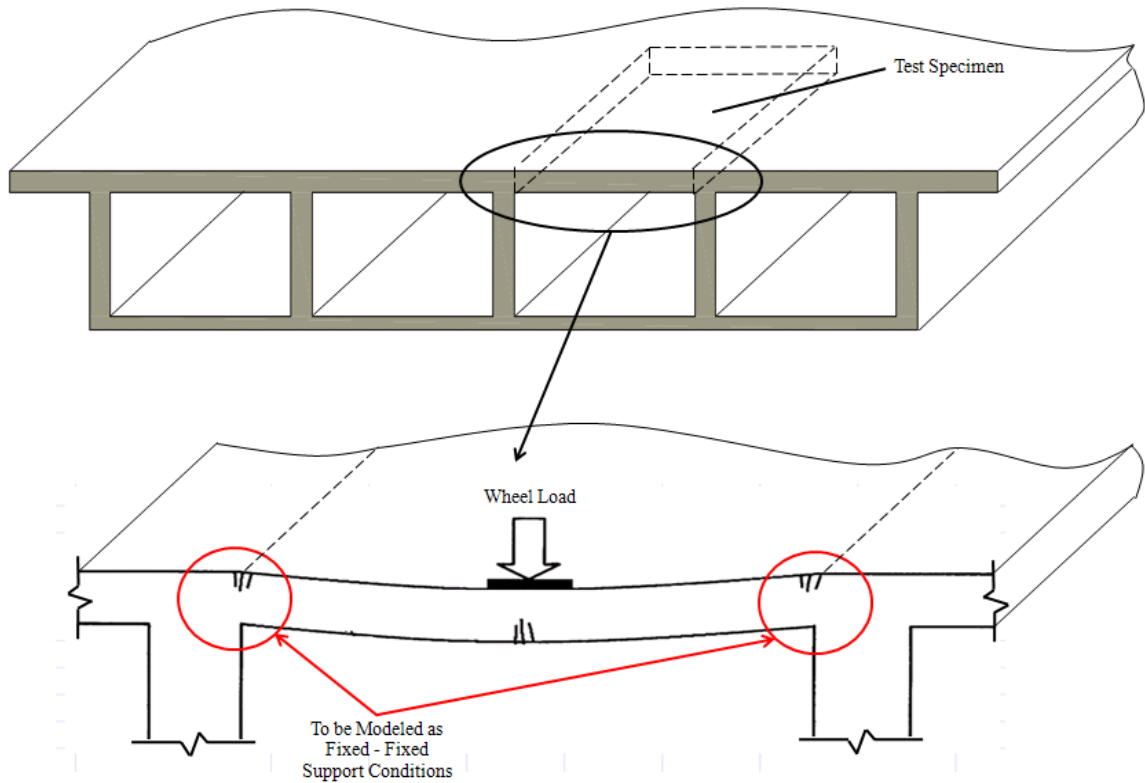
Continuity Conditions in a Deck Element of a Box Girder Bridge
